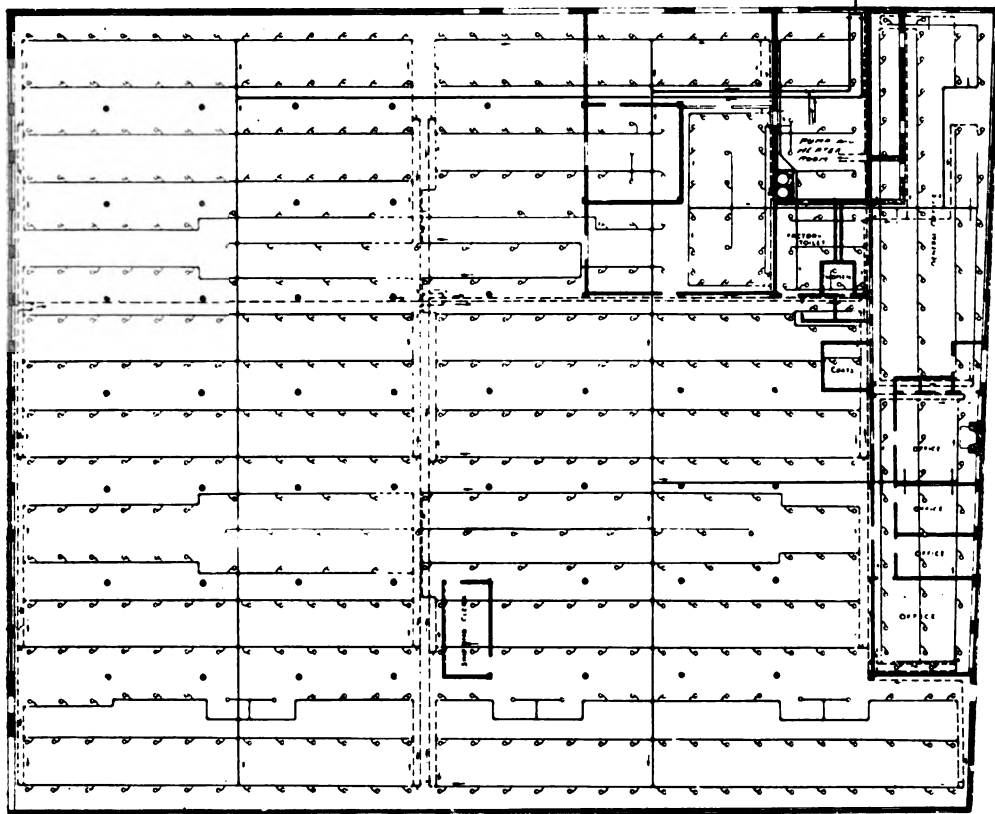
PIPING LAYOUT FOR HOT WATER HEATING AND SPRINKLER SYSTEM, PLANT OF WHEELLOCK, LOVEJOY & CO.
